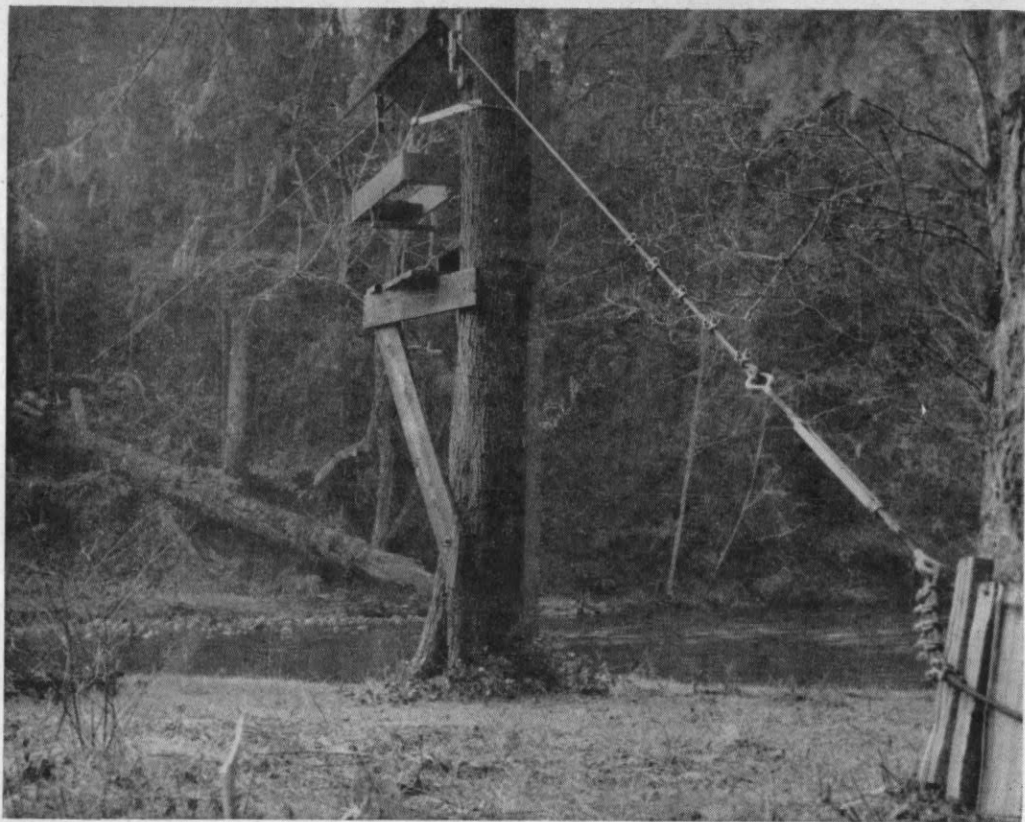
Cable installation utilizing trees for support and anchorage. Mashel River near La Grande.
